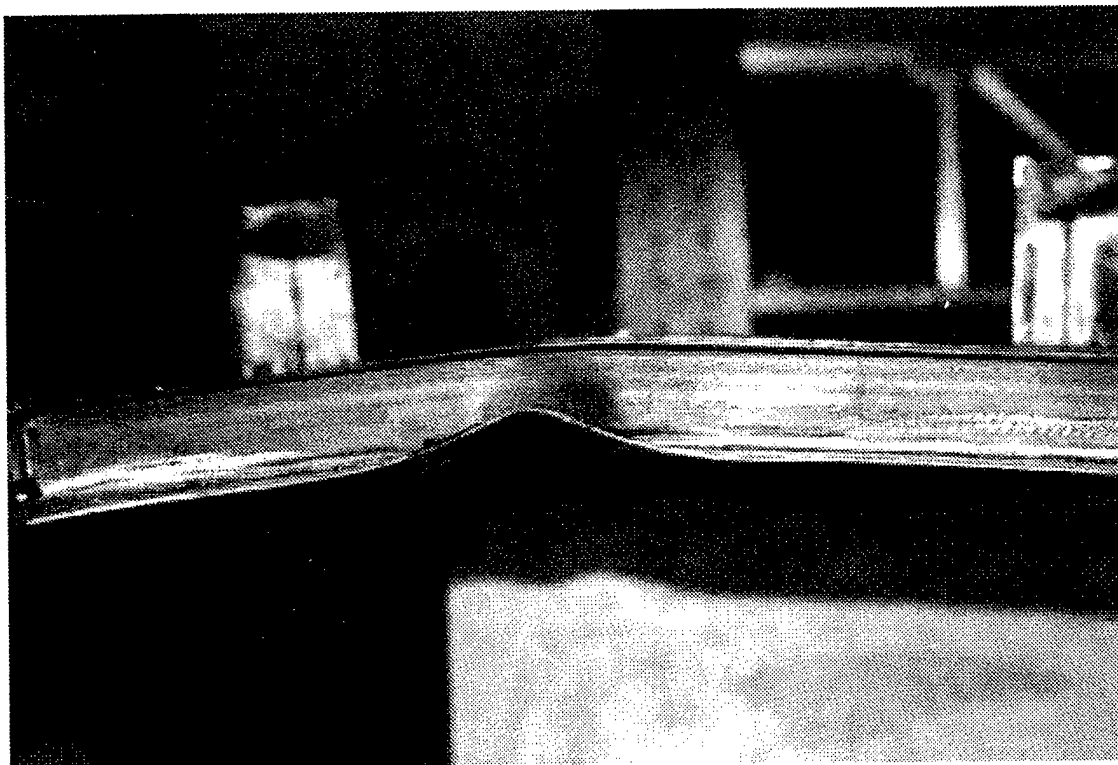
Detail of Plate & Stiffener in the Center Bay of Grillage 0995
